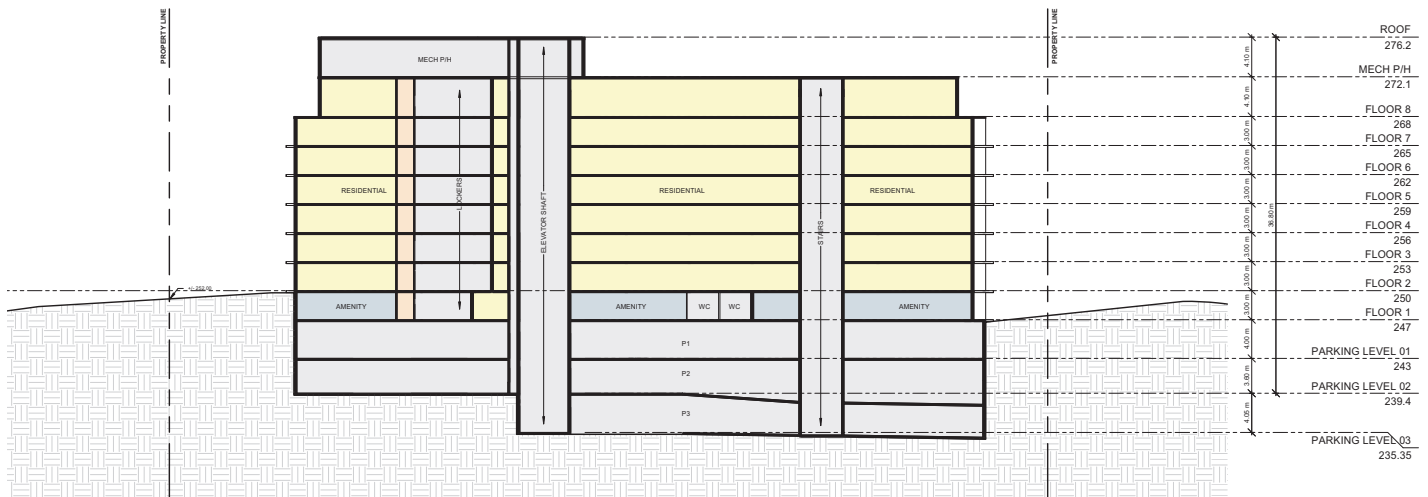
Site cross section looking north prepared by Turner Fleischer Architects Inc.
